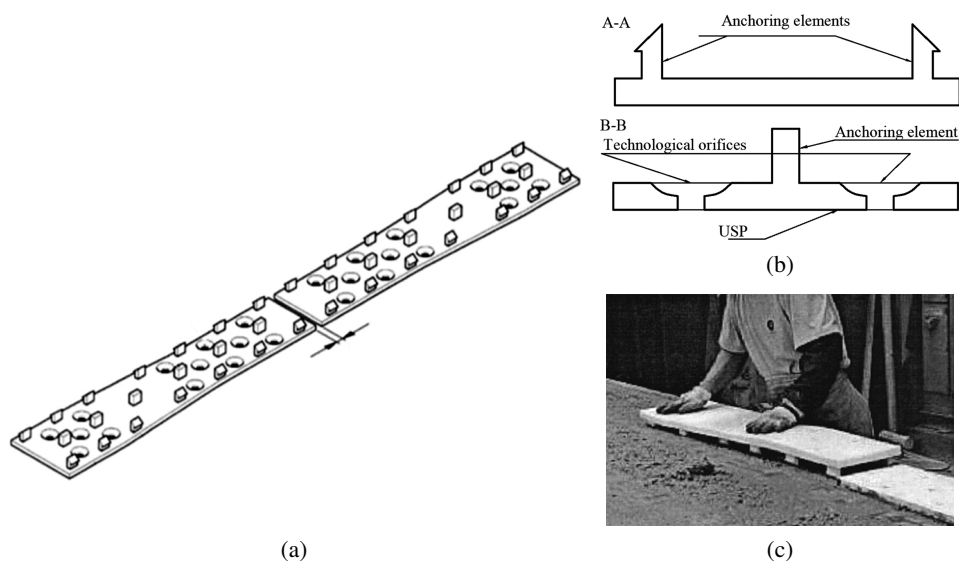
USPs used on Korean railways: (a) anchor layer; (b) anchoring scheme; (c) placing USPs with an anchor layer on the unset concrete of the support [23]
